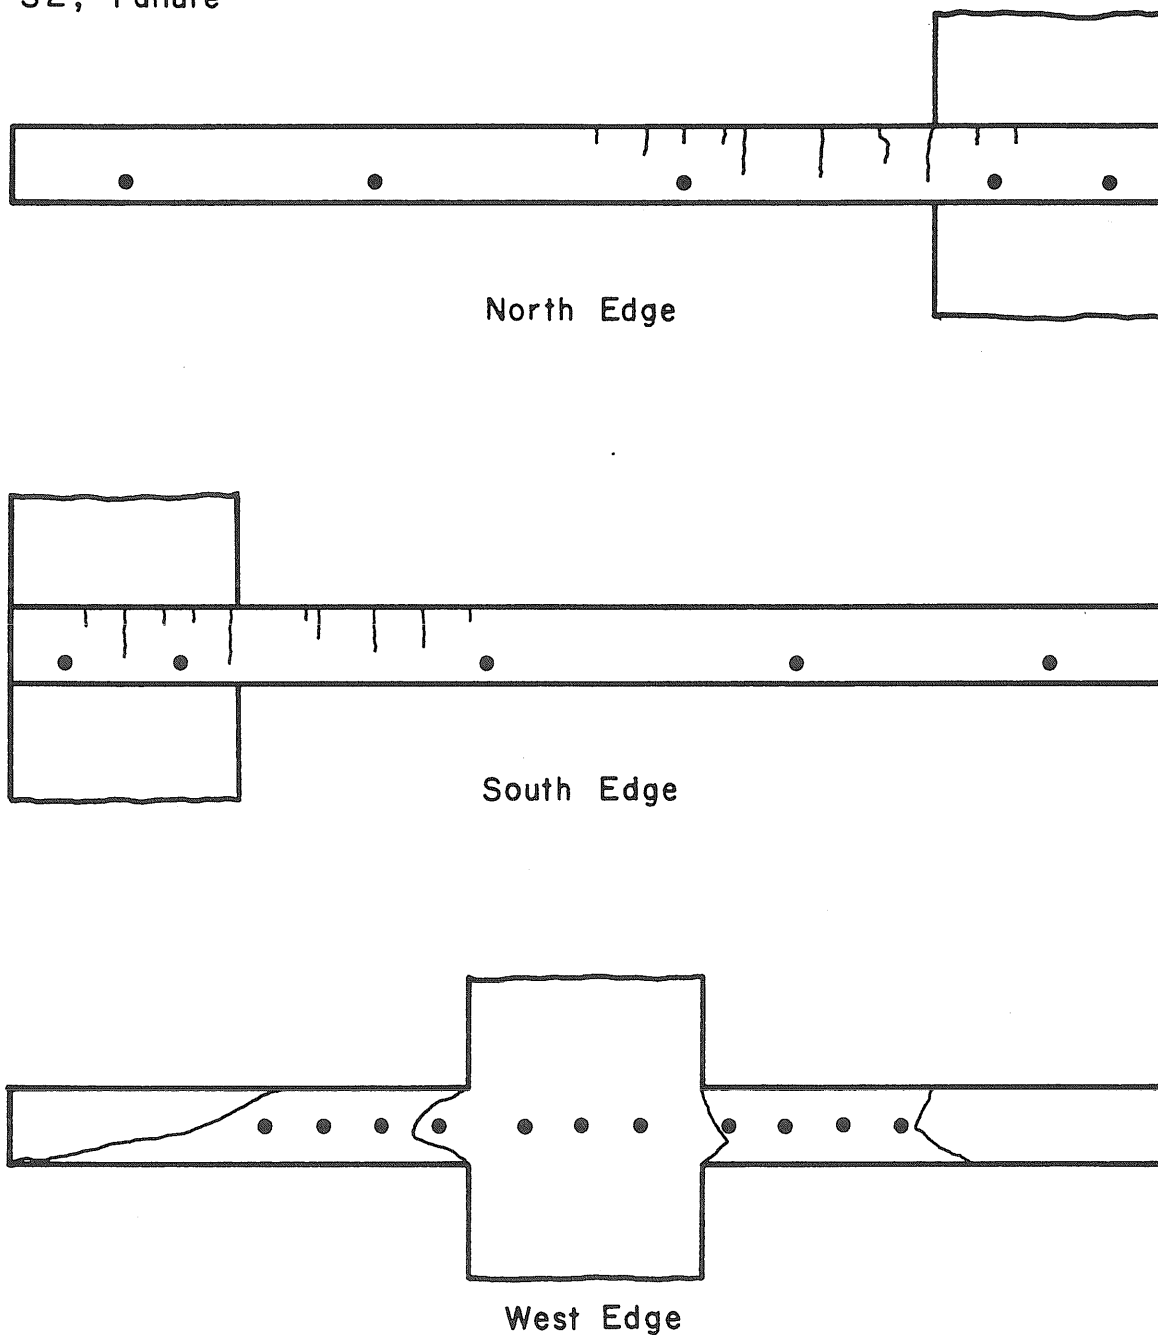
Crack Pattern at Failure on the North, South and West Edges of Specimen S2
